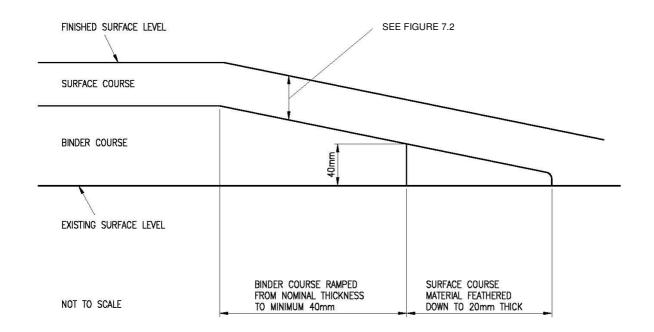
Ramps between New Surfacing and Existing Pavements
